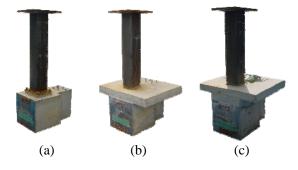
Types of specimens: (a) Exposed type,(b) Flat slab, (c) Elevated grade beam
